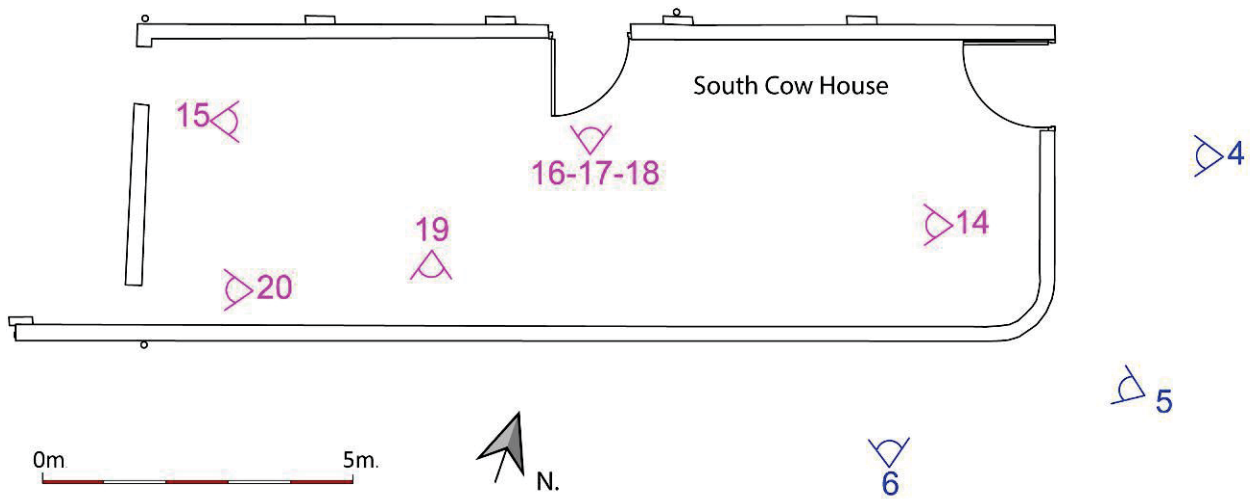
Plan showing the direction of the photographs taken in the south cow house.
